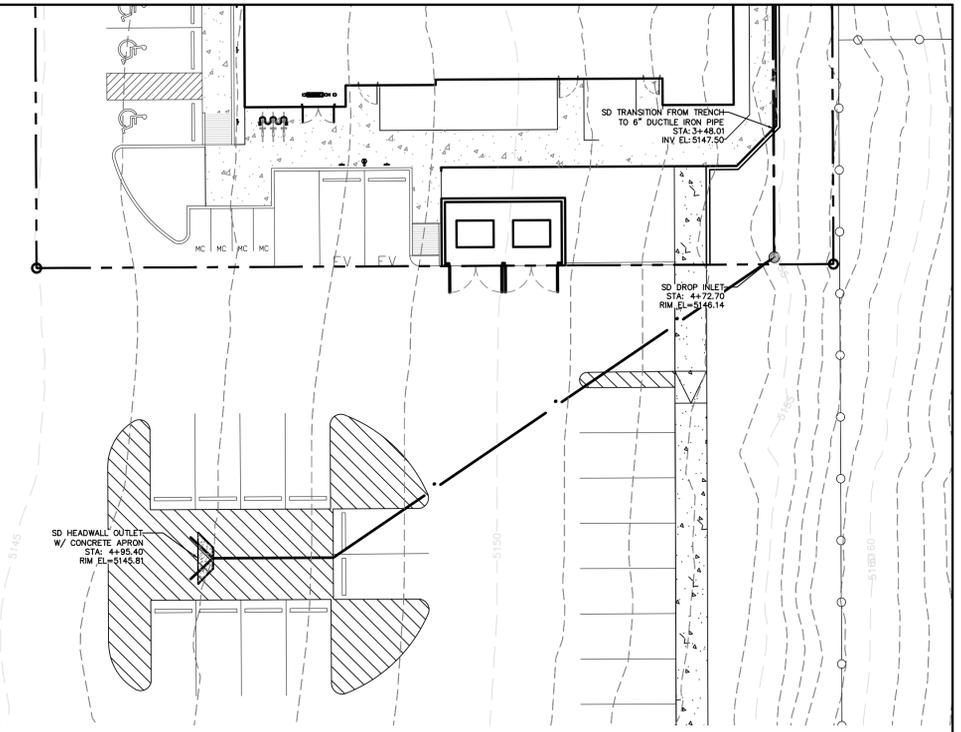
DETAIL B-B - ON-SITE STORM DRAIN SYSTEM
